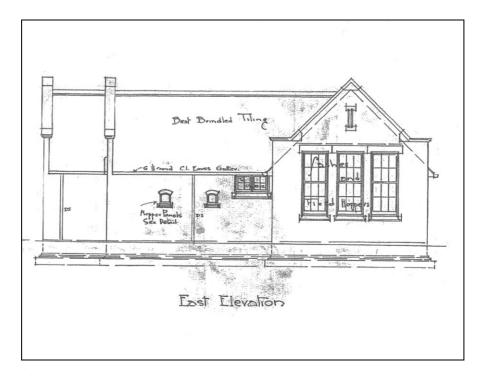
East elevation, proposed extensions to Stafford North Street Council School for Infants c.1909
